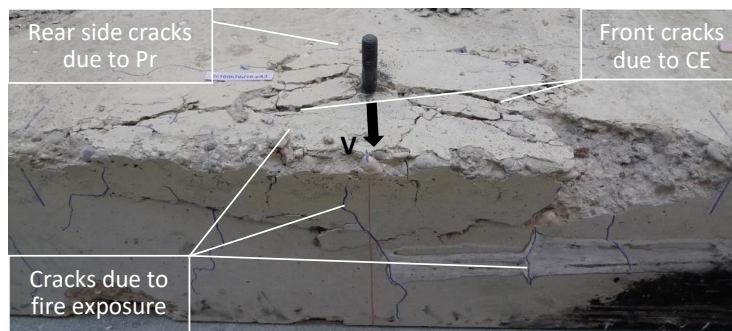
Concrete edge failure in combination with pry-out failure of anchors close to edge loaded in shear after fire exposure.
